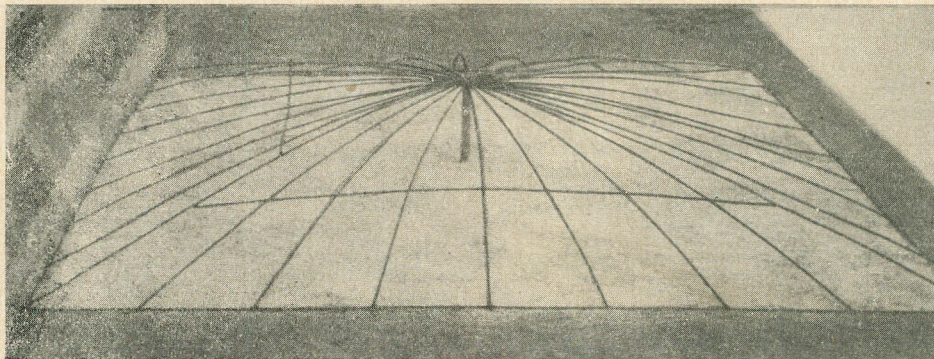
Welded mild steel bar frame for forming the centring of the vault roof.
